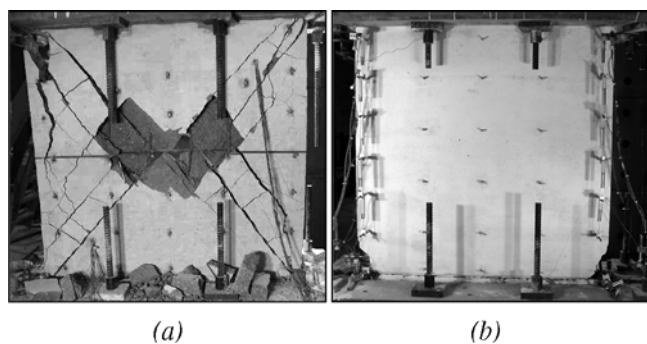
Typical failure mode of wall specimens: (a) Type 1 wall spandrel at 2.0% lateral drift (typical for Types 1, 2, 3, and 5); and (b) Type 4 wall spandrel at 3.0% lateral drift.
